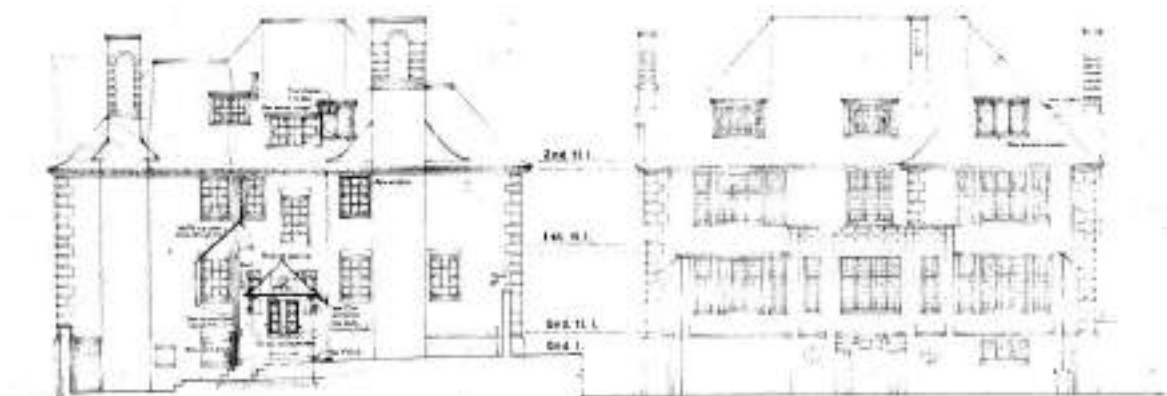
Extract from application 3712 showing the proposed east elevation (left) and rear elevation (right)
